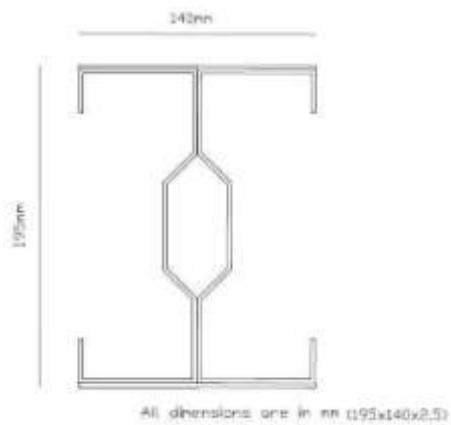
HorizontalCorrugationWithoutSpacing 2.3
